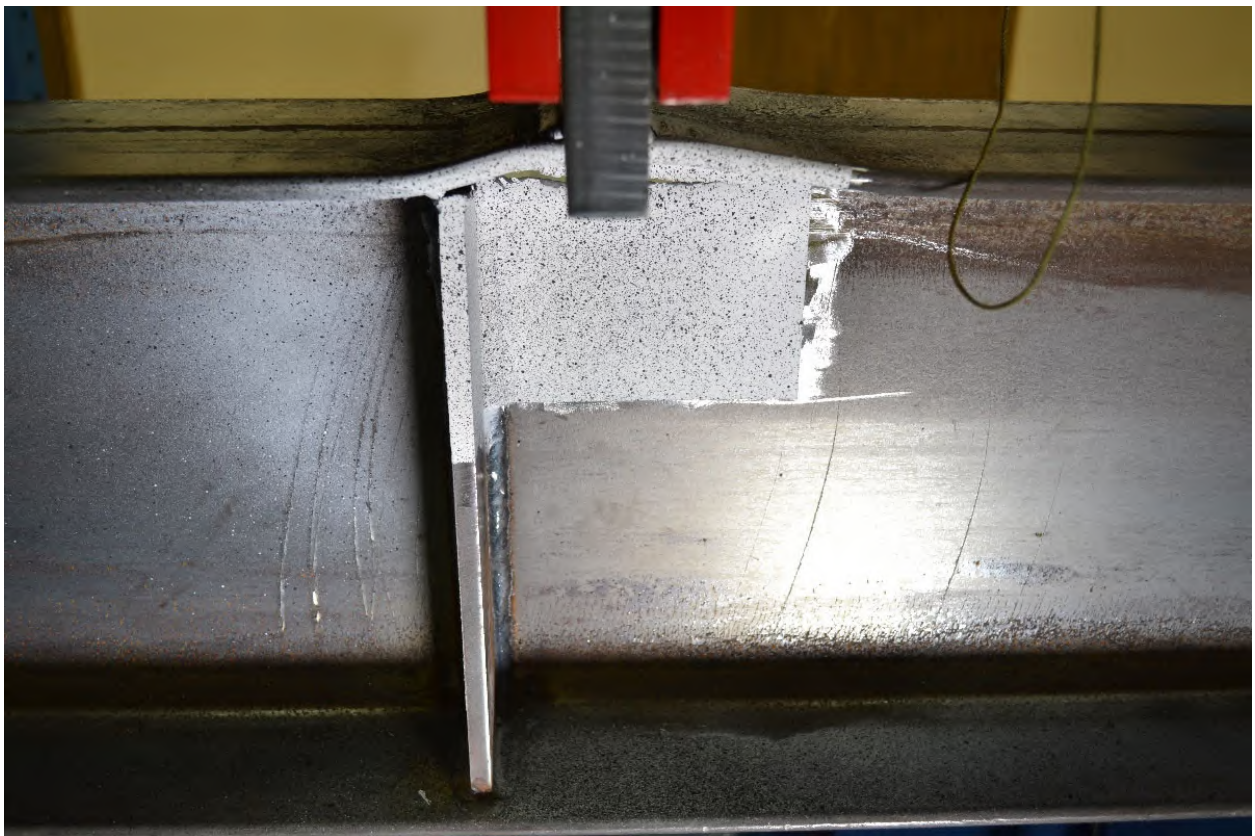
W12X26-ST-E4 after testing emphasizing flange yielding
